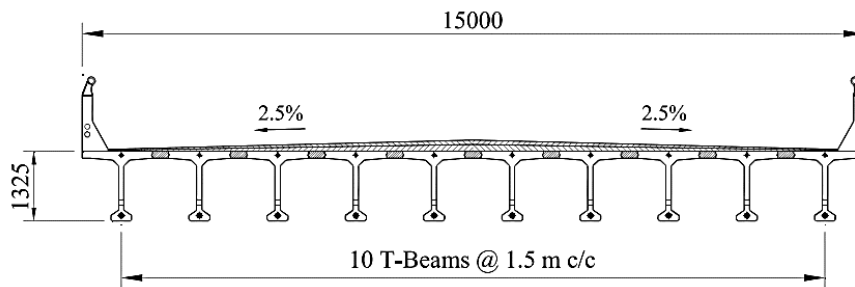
Typical section view of Sungai Nerok Bridge [mm] [32].
